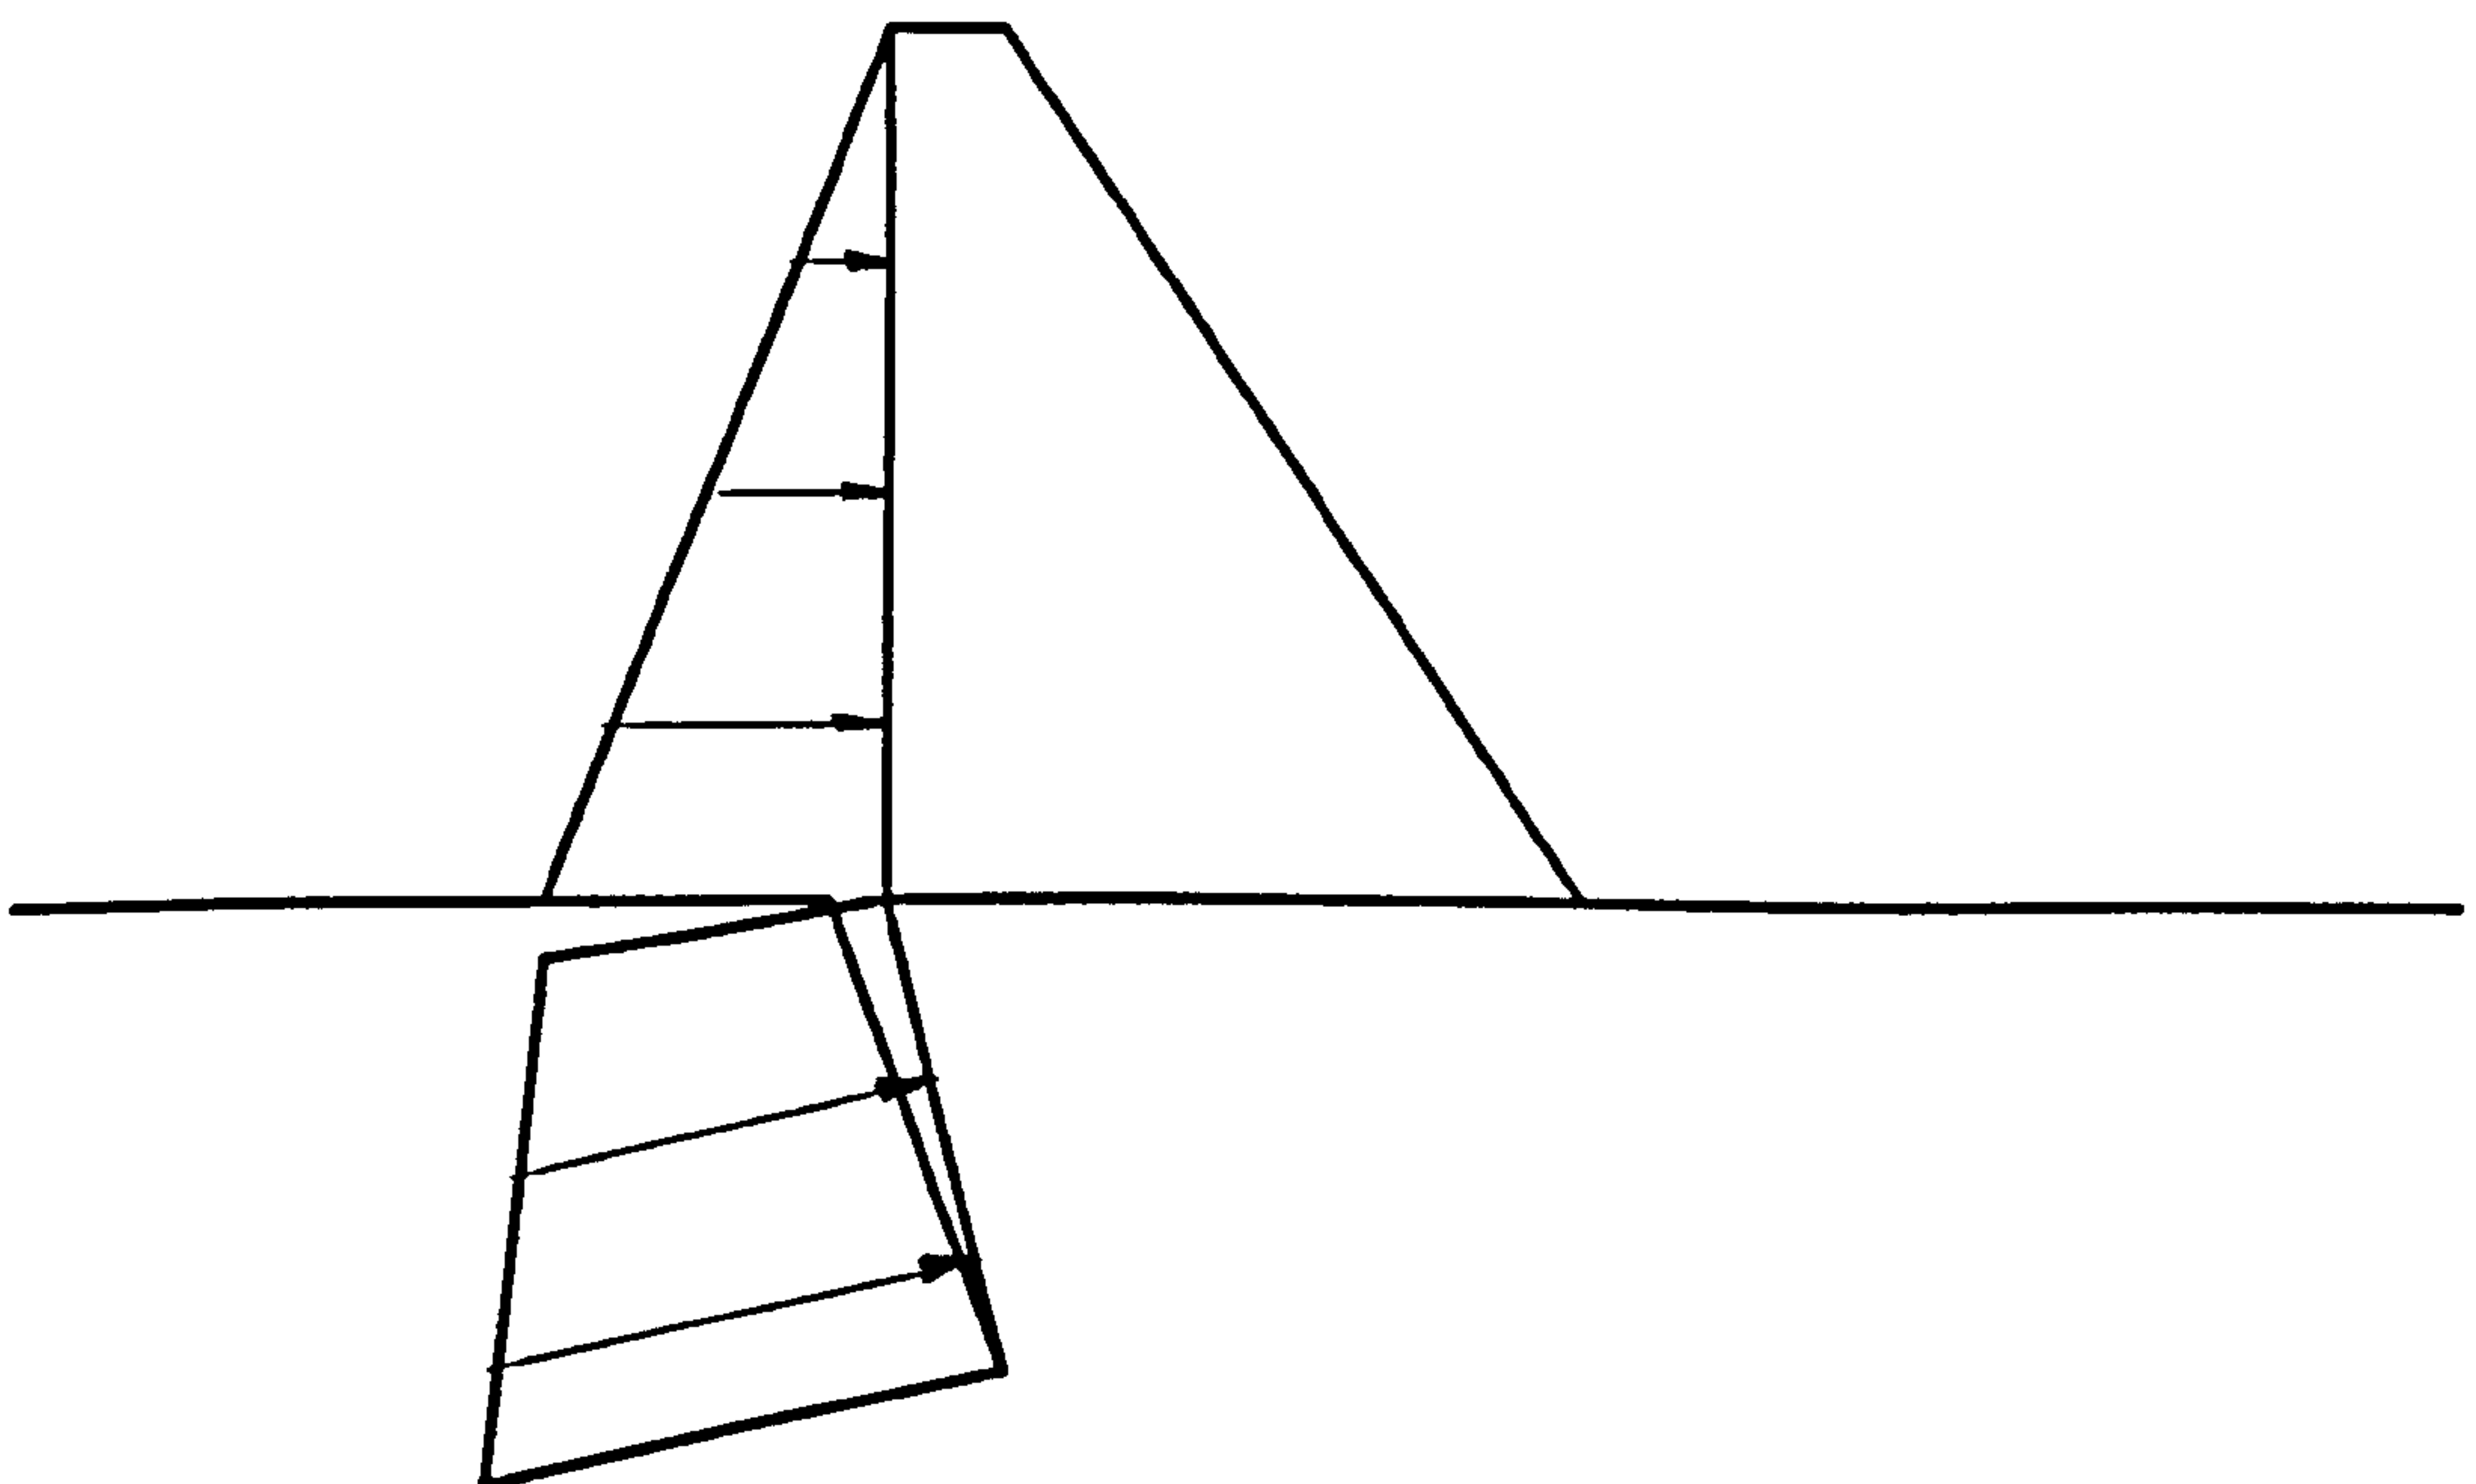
Non-horizontal crack in the foundation
